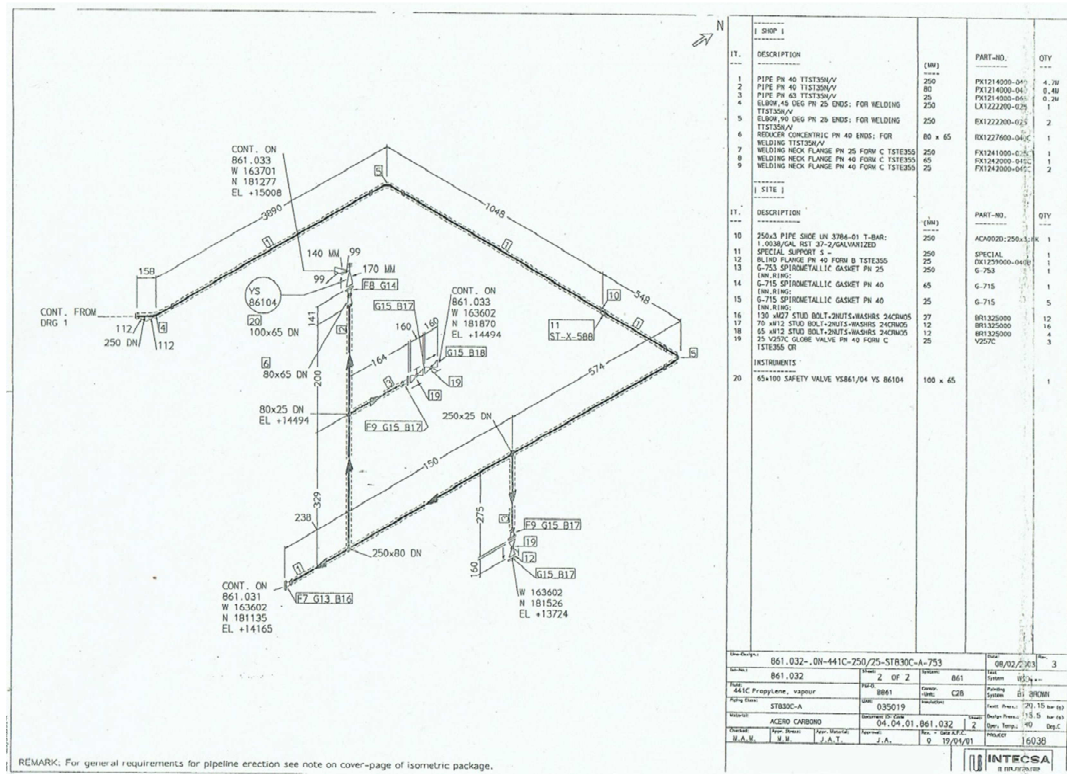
Isometric drawing of YS861-04 sheet 2.
